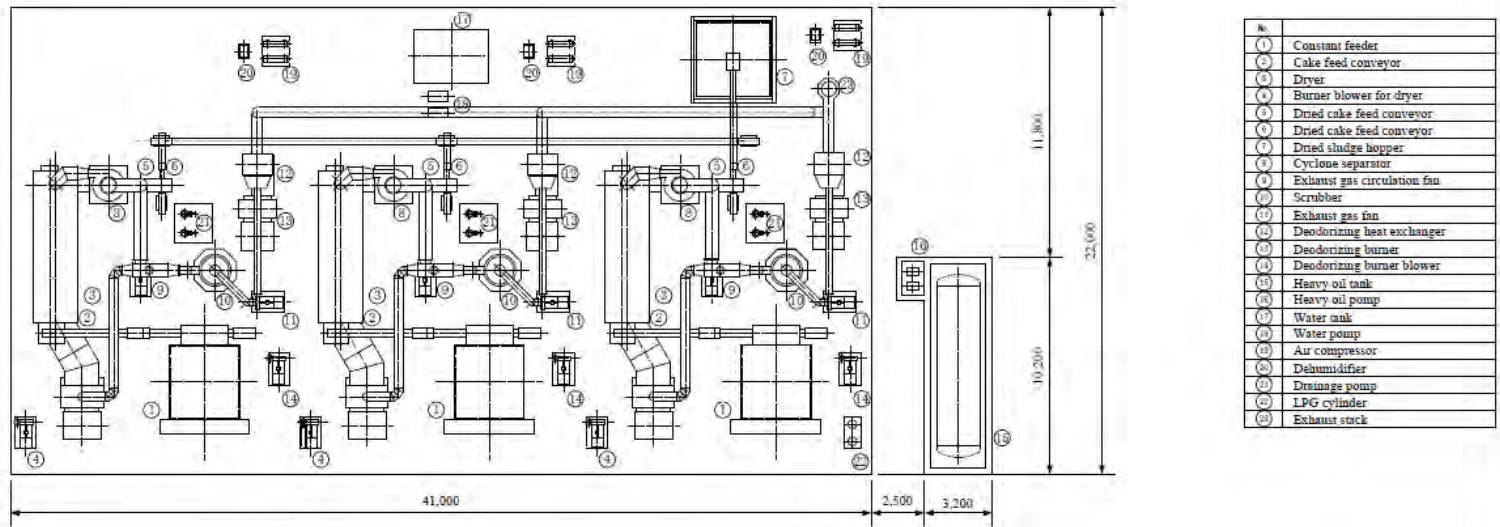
Plan View of the Sludge Processing Center (Source: JICA Study Team)
